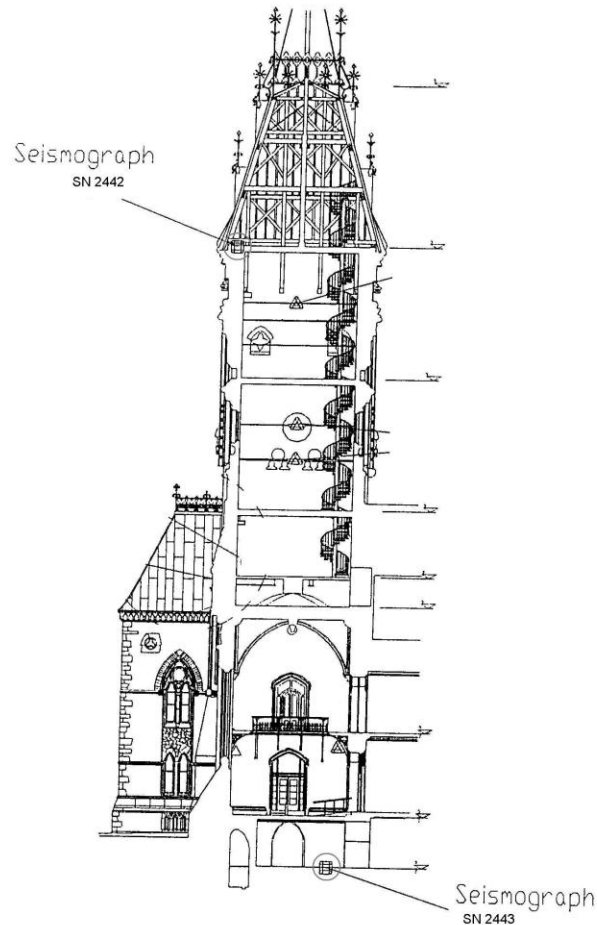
Layout of accelerometers at the South-West Tower of the East Block.
